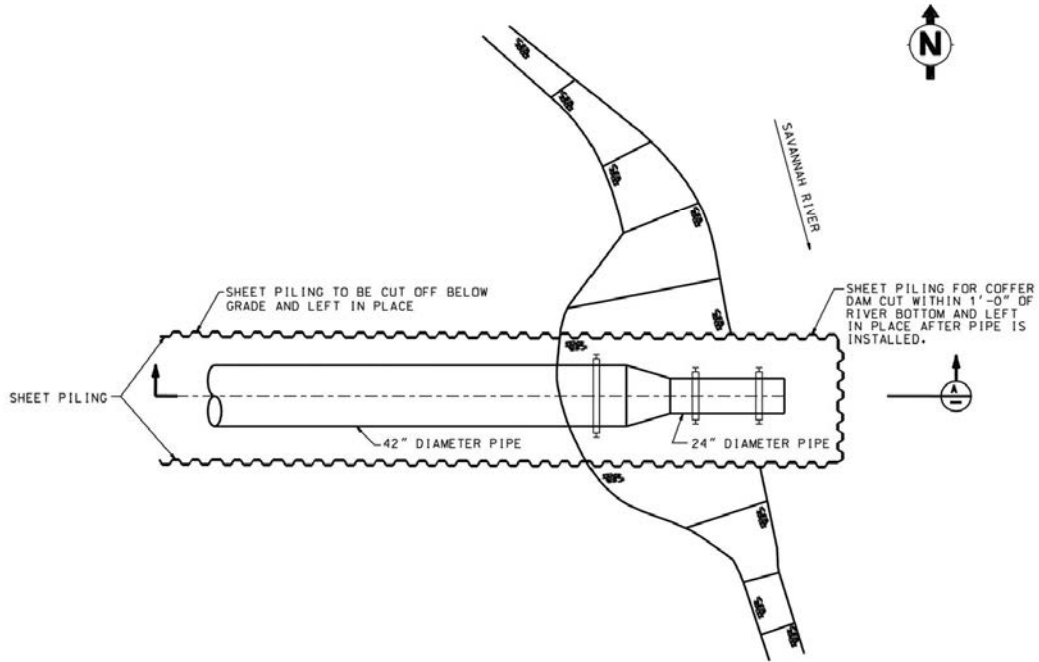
Plan View of Proposed Discharge Outfall (Southern 2007a)
